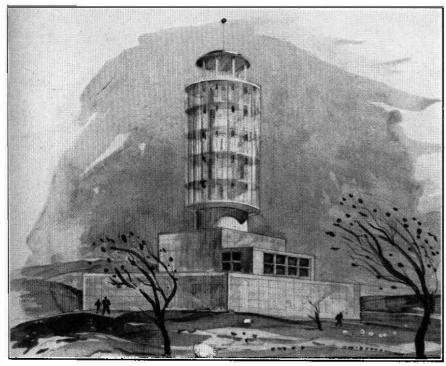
SKETCH OF PROPOSED BUILDING FOR MULTI-BROADBAND RADIO-RELAY STATION.
